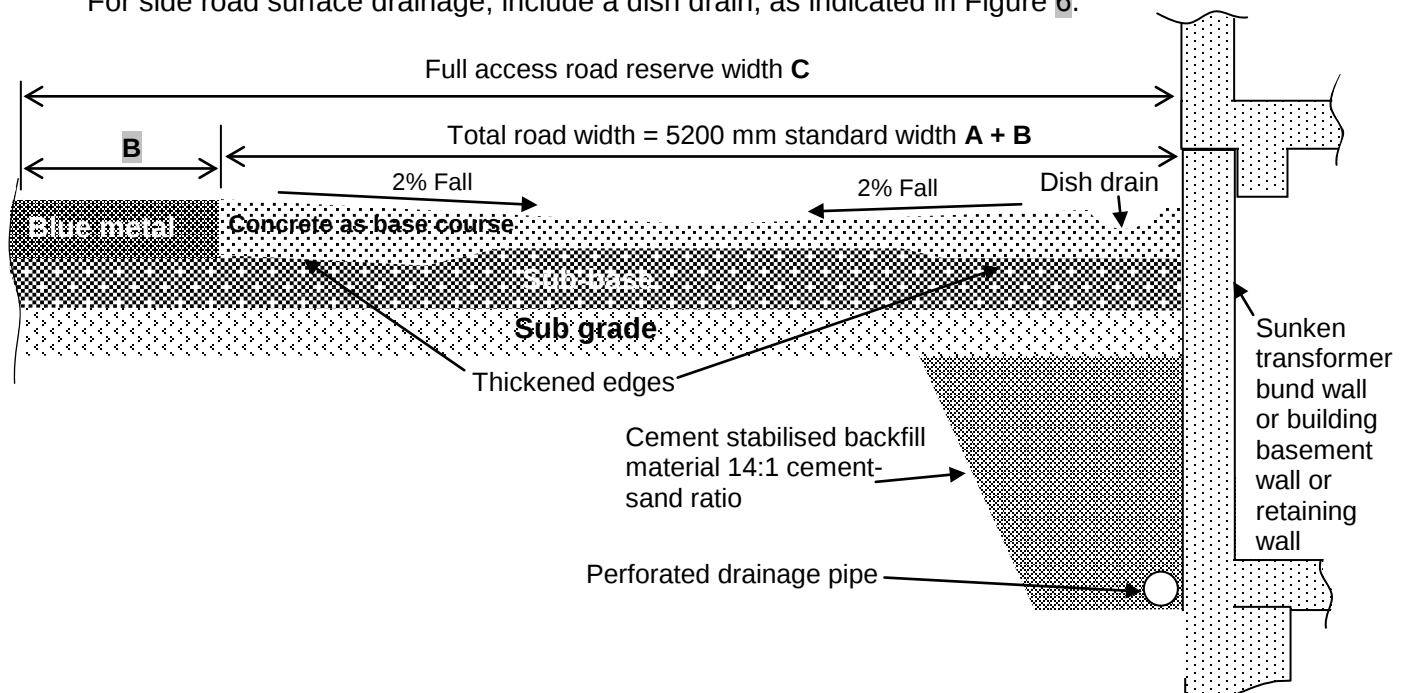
Sketch of cross section of typical section of access road at higher level than TX bund floor (sunken TX bund designs) or abutting building basement or a retaining wall (reinforcements not shown)
